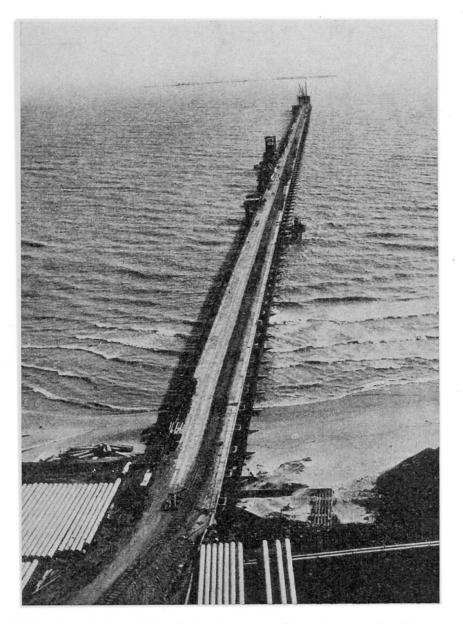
ANIC loading dock at Gela, Sicily. Prestressed foundation piles (Impresa Vianini).
